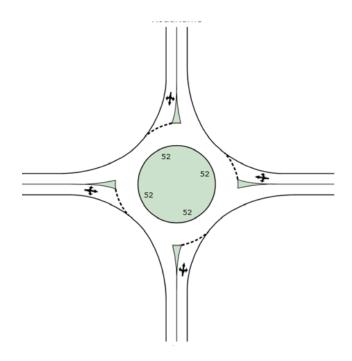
Conceptual Roundabout Design for Intersection of Bigelow & O'Hara
